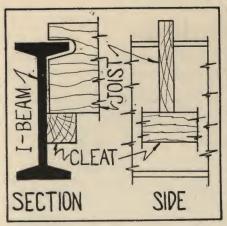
Wood Joists Resting on Wood Cleat Bolted to Web of Steel Beam.
